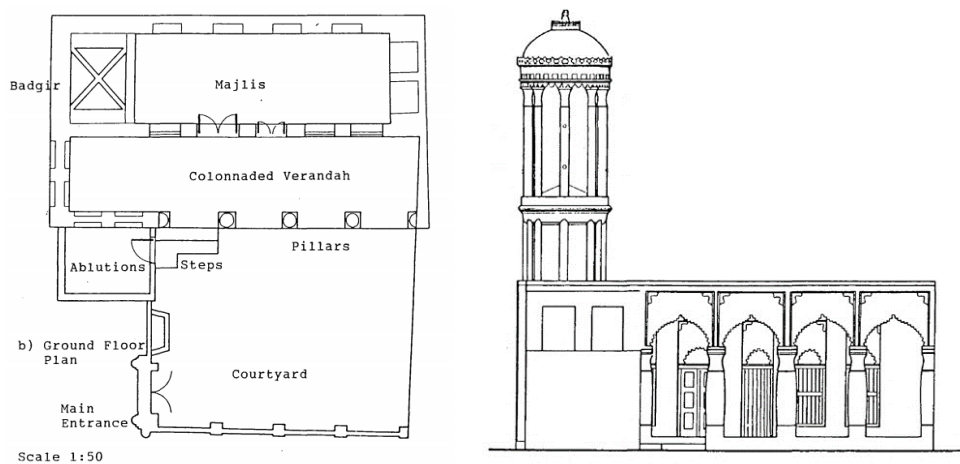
The Al Midfa House plan (left) and elevation from the courtyard (right) [84]
